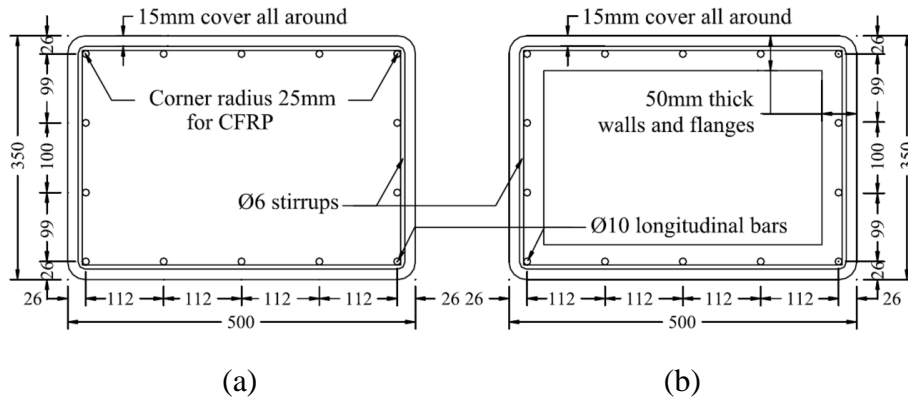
Cross sectional details of (a) Solid beam (b) Box-section beam (dimensions in mm), Hii and Al-Mahaidi (2006)
